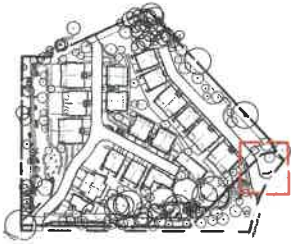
DETAIL PLAN: TERRACED WALL TOWNHOUSE PLANTING CONCEPT
